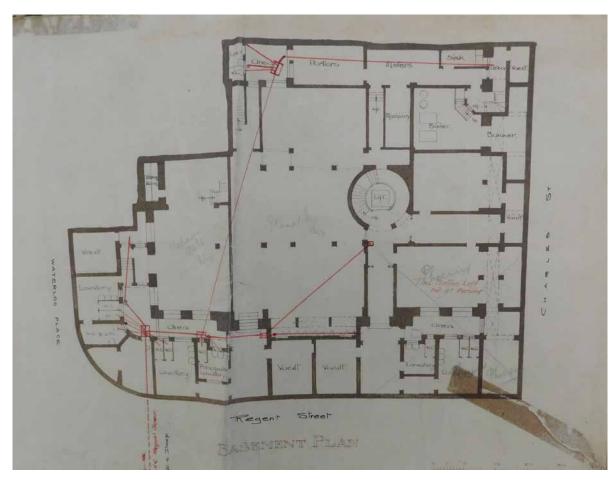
1912 Basement floor plan of 12 Waterloo Place, WPA
